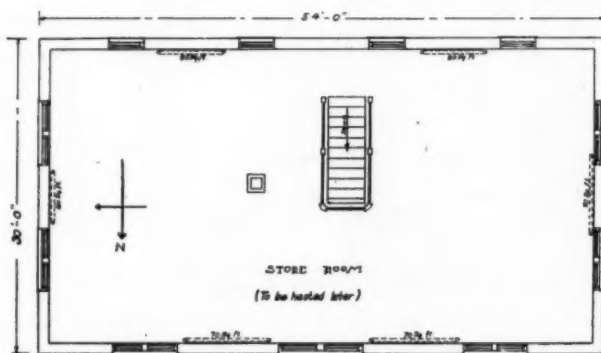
PLAN OF SECOND FLOOR OF CONSERVATORY.
